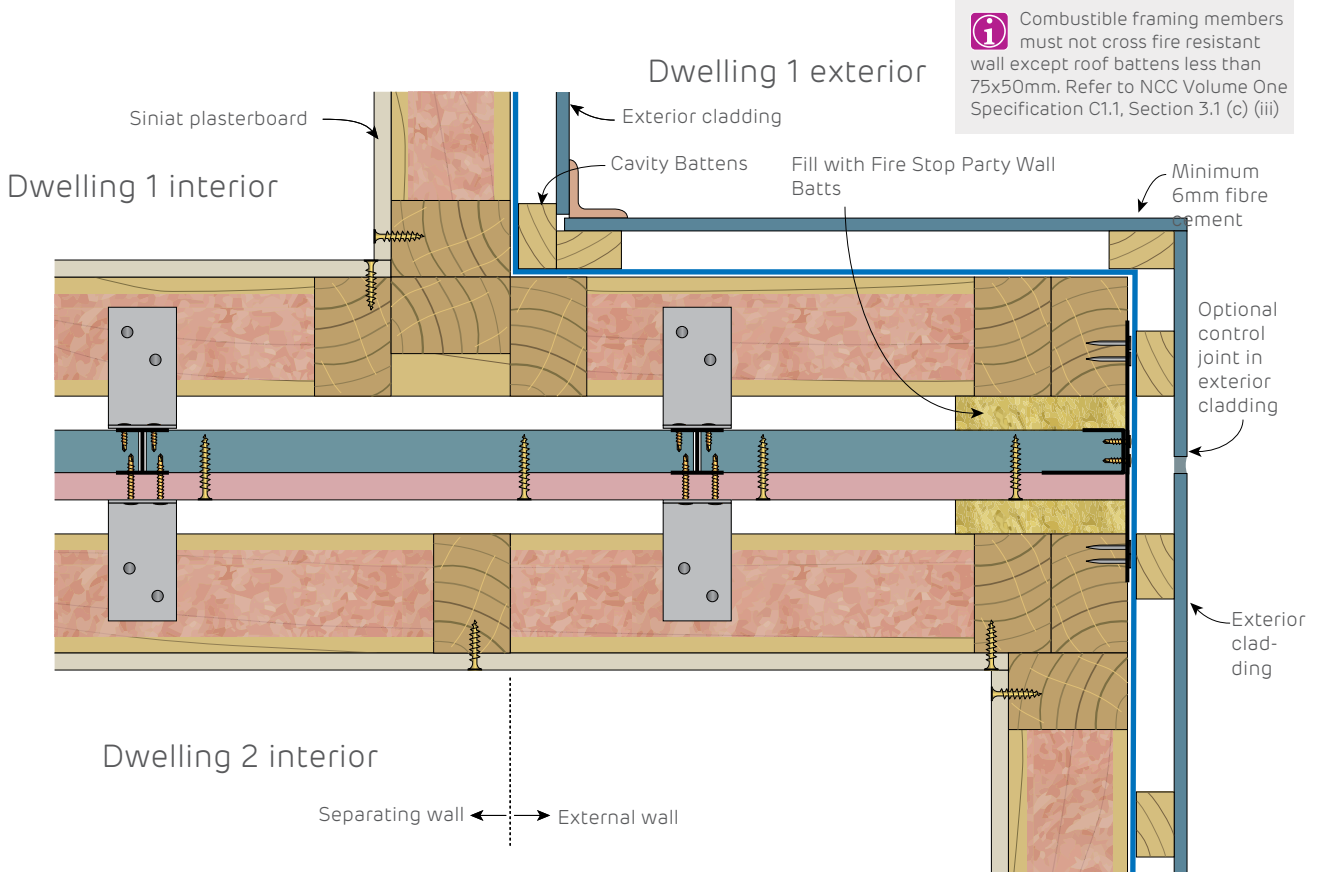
Interhome Wall to External Clad Wall with Cavity battens with Return
